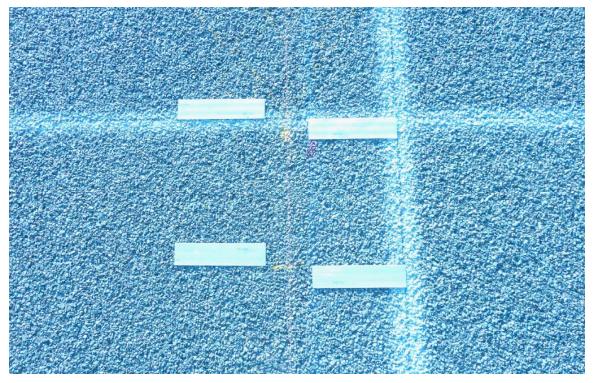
ICC SurPRO 4000 pavement markings at start of chip seal section.
